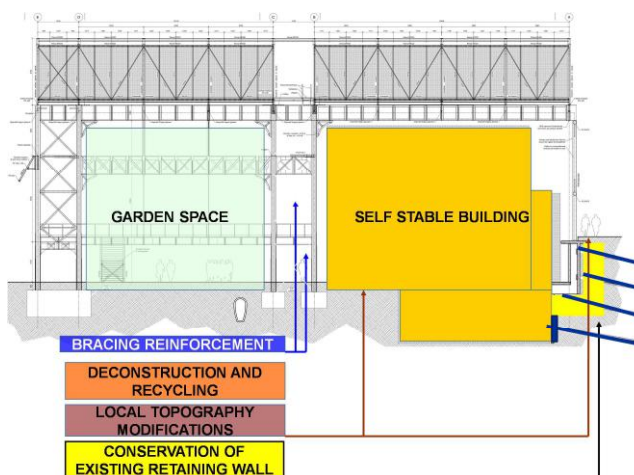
The new anchorages on the retaining wall and the design hypothesis
